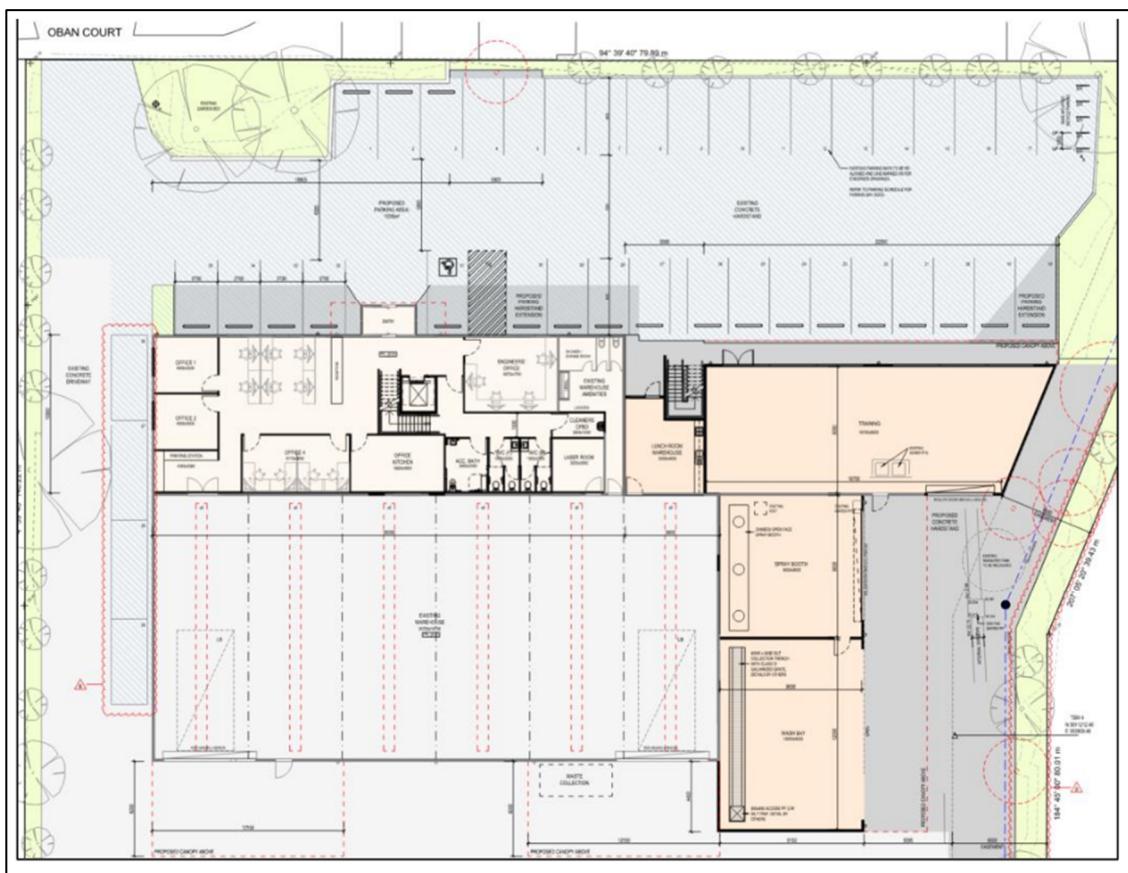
Onsite Parking Layout. Prepared by KLM Spatial
